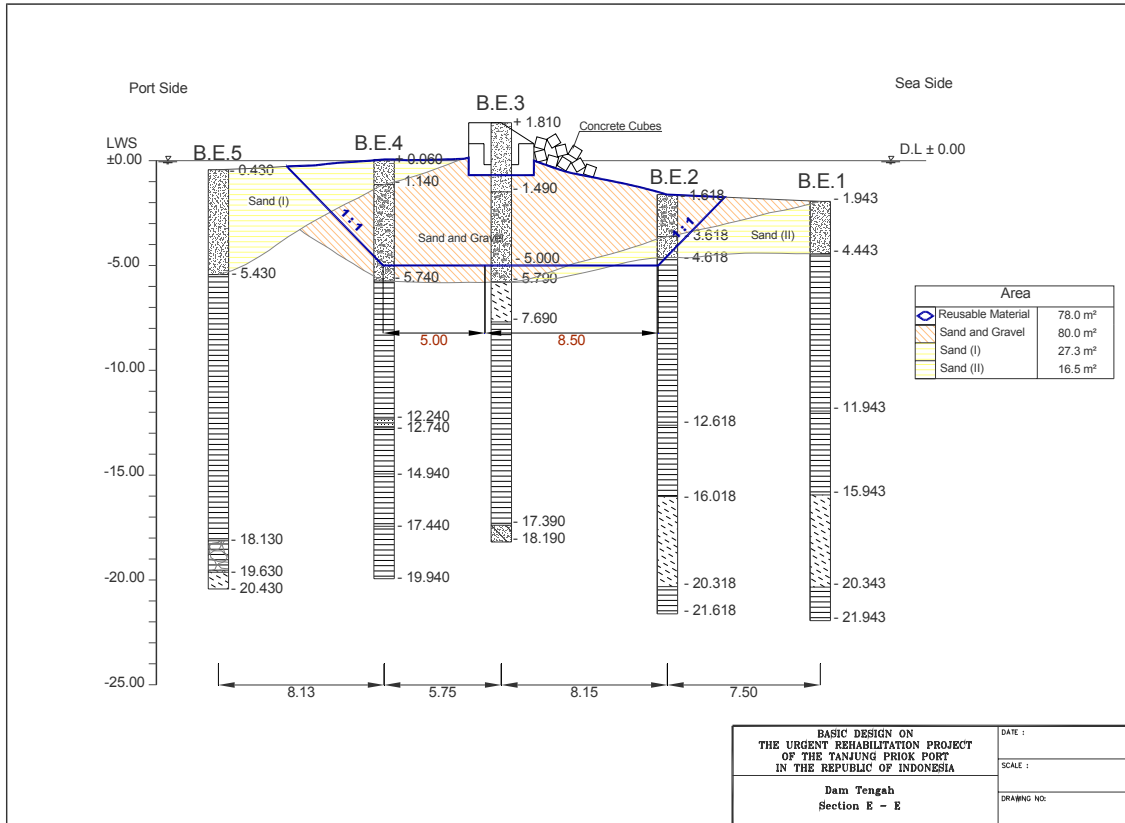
(4) Excavation Section shown with Boring-Log in the Segment 4
